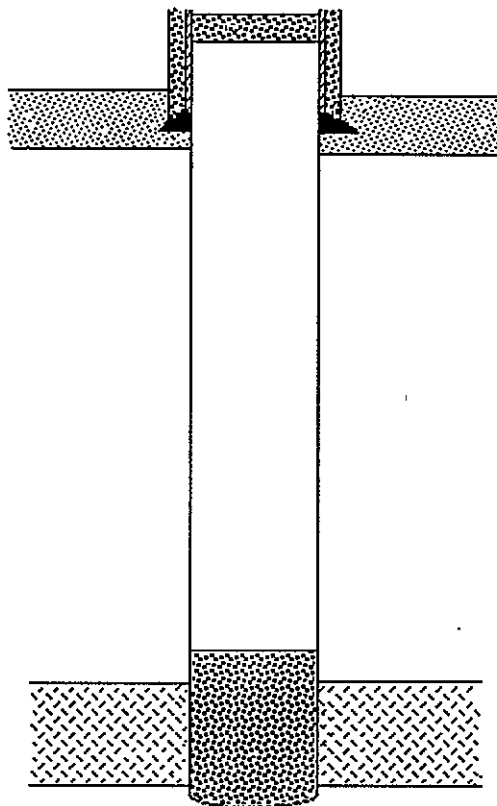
TYPICAL WELL CONSTRUCTION - WESTERN AREA SHALLOW WELLS
